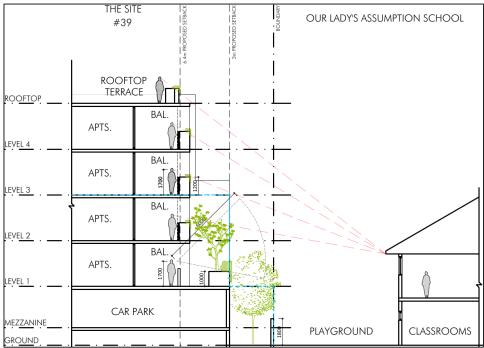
Extract of Section Plan 1B - North Western Lot Boundary
